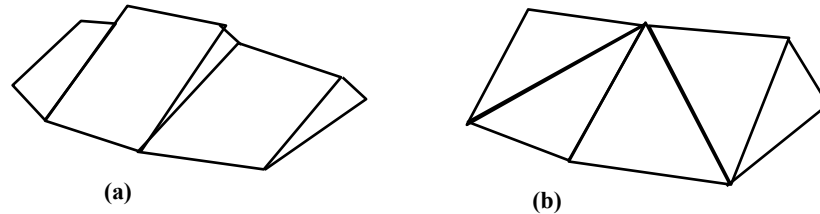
, Sample modified roof shapes for rectangular housing unit: a) split surface; b) folded plate.
